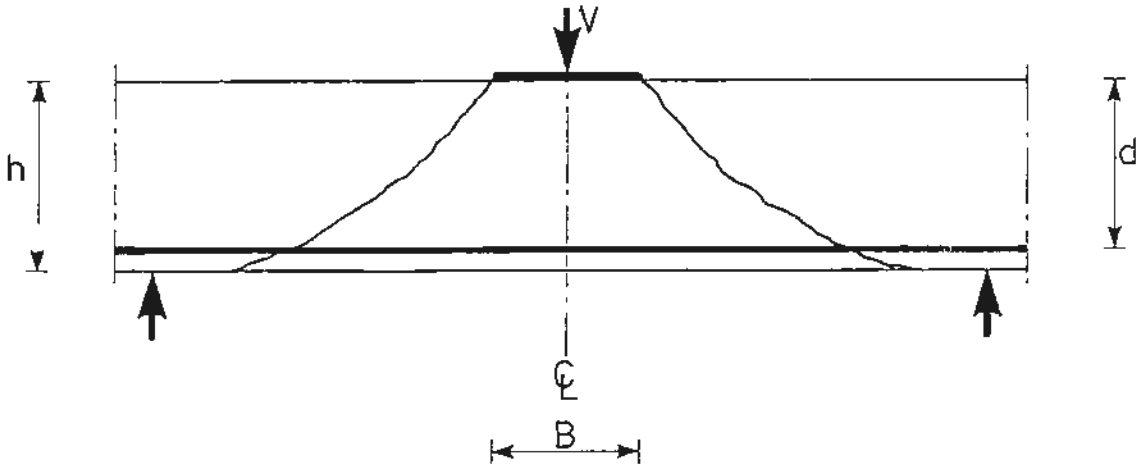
Punching shear failure of reinforced concrete slab
